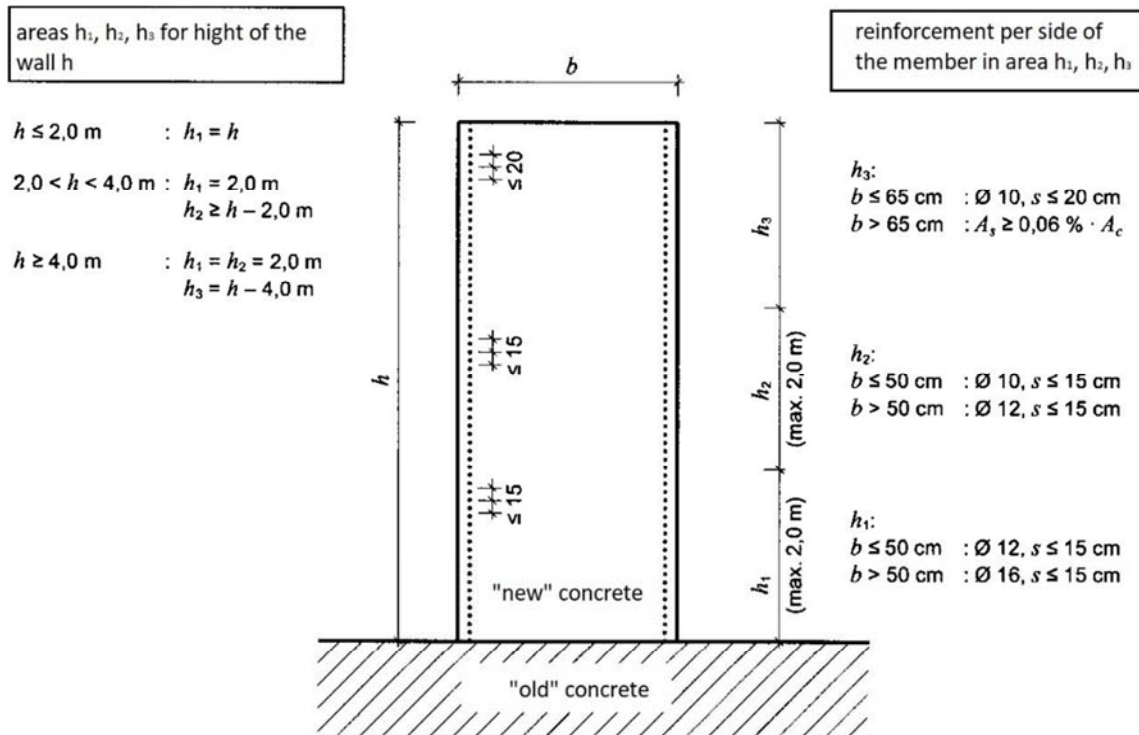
Construction related minimum reinforcement in restrained structural members according to DIN EN 1992-2/NA (figure NA 9.110.1DE).
